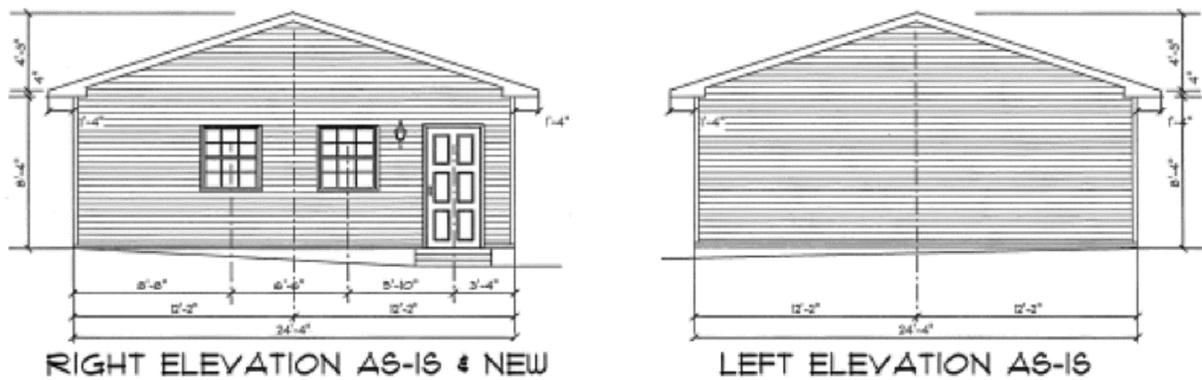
Side elevations, existing detached garage. Source: Applicant.
